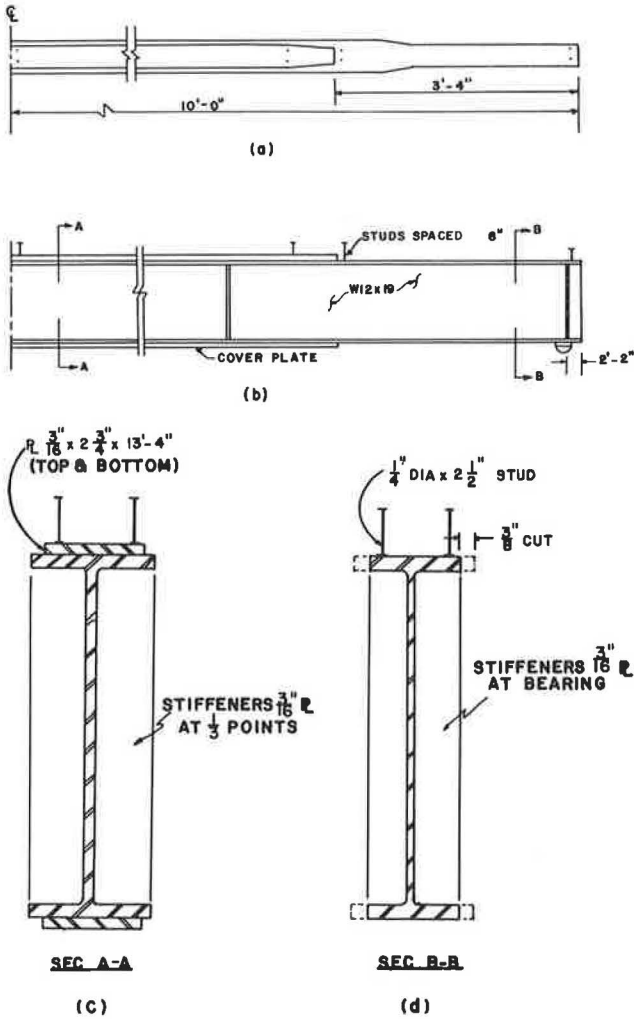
Details of model beams: (a) half-plan view, (b) half-elevation, (c) typical cover-plated section, and (d) typical end section.
